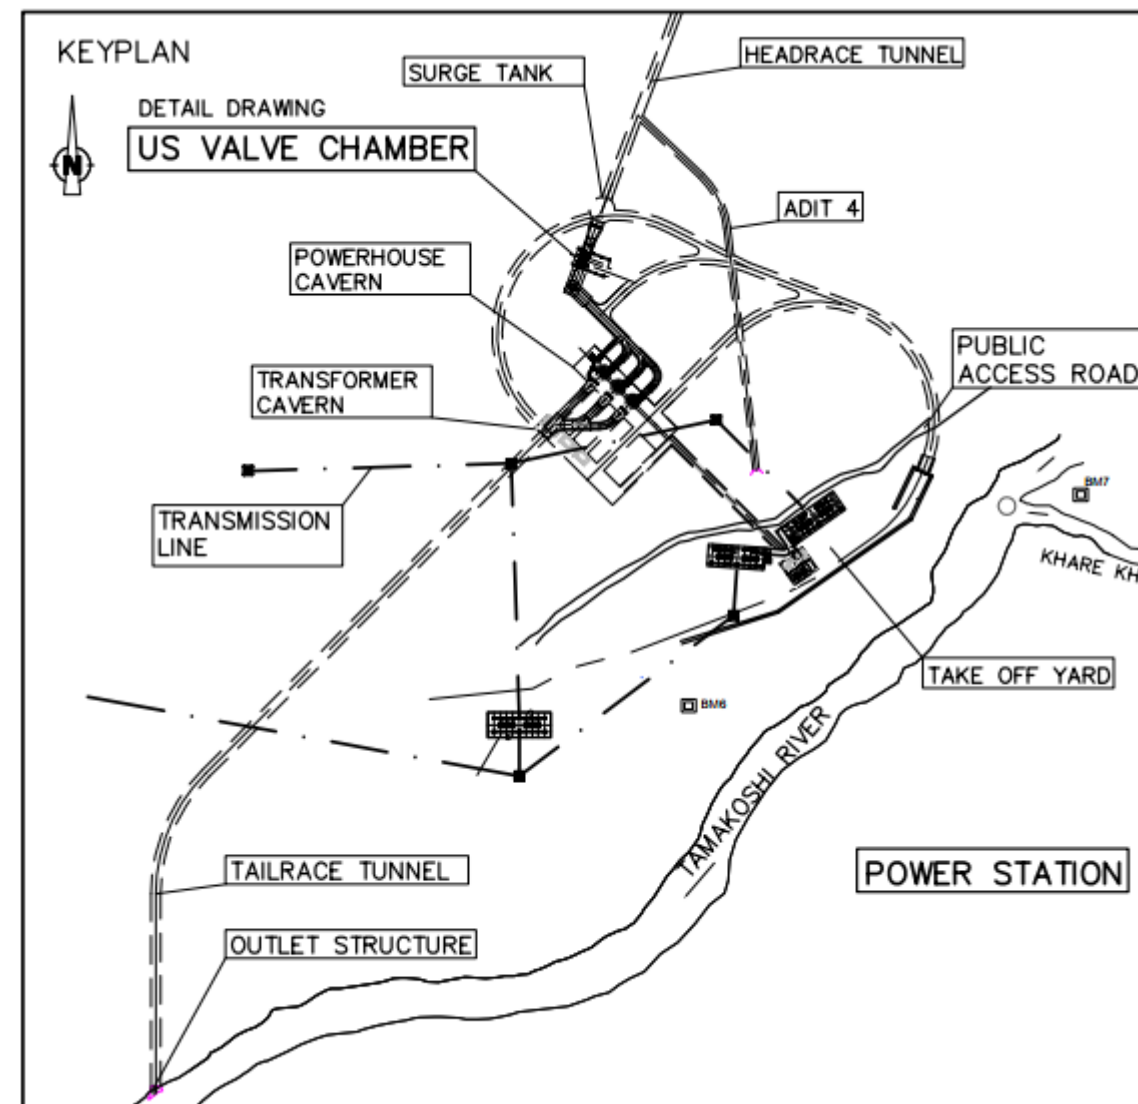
Sketch of the plan of US valve chamber and surrounding structures
